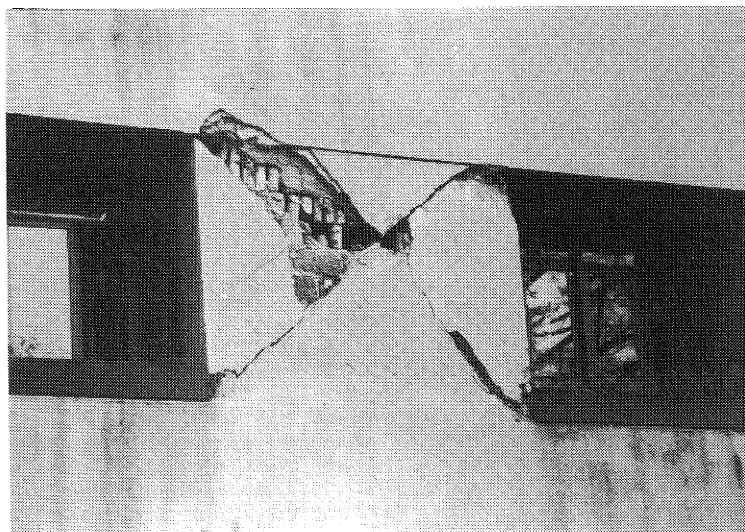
Hyatt Terraces Hotel, Baguio; infill masonry wall?
